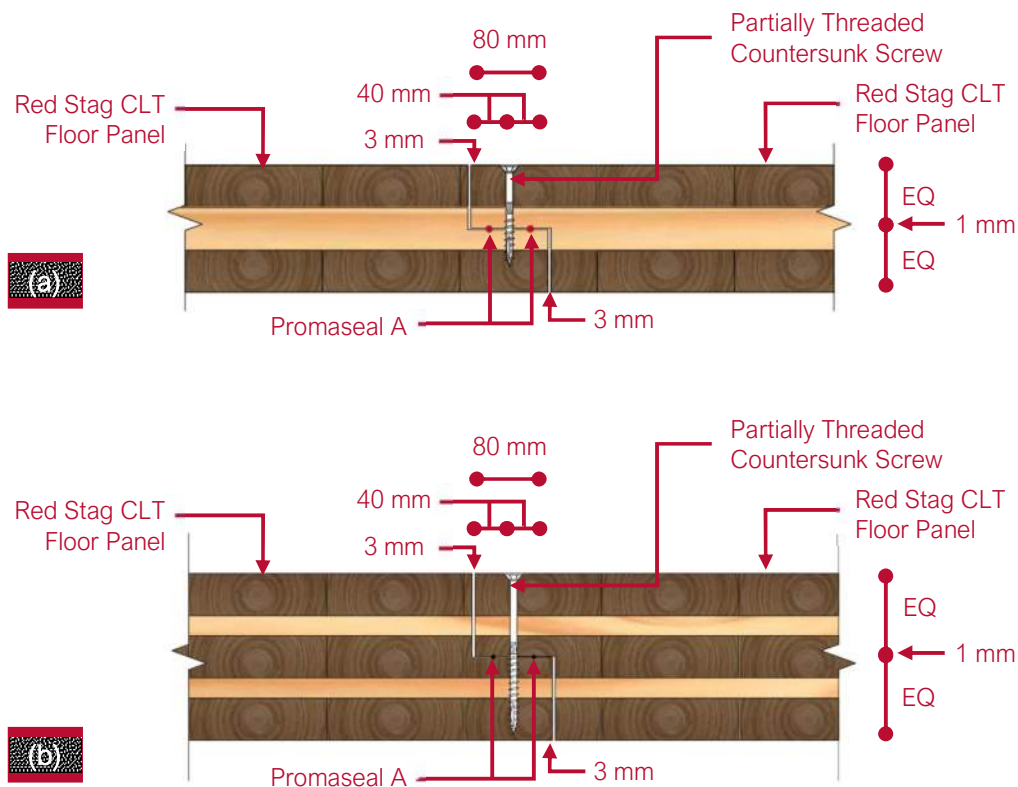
Red Stag CLT Panel to CLT Panel Half Lap Joint Connection ^{[24], [25]}.
